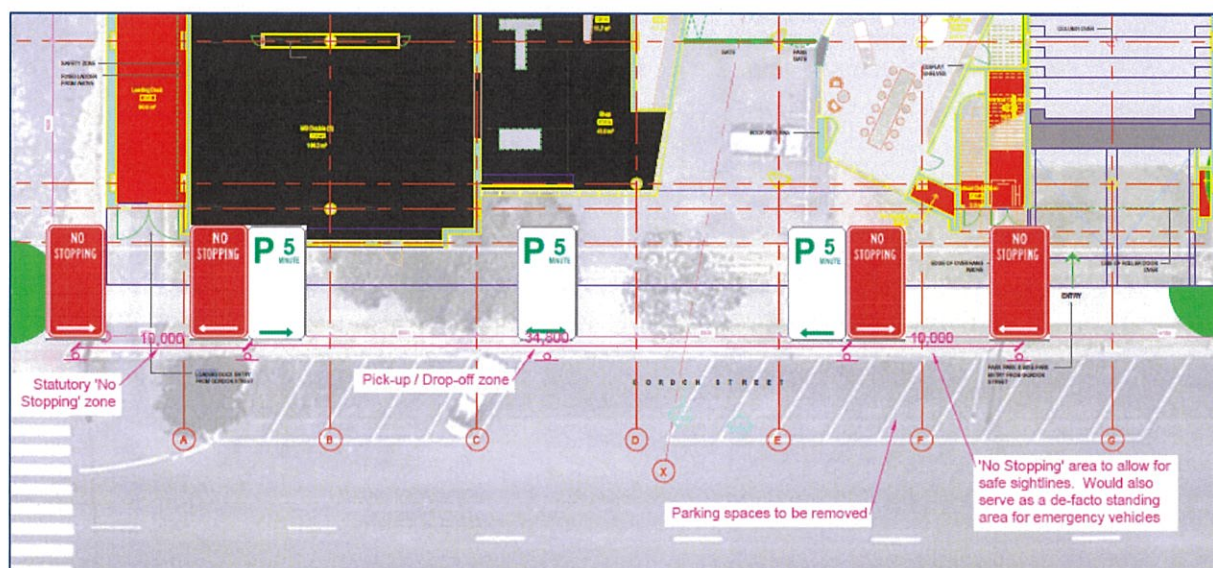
| Layout of pick-up and drop-off zone (source: Applicant's Traffic Impact Assessment)
